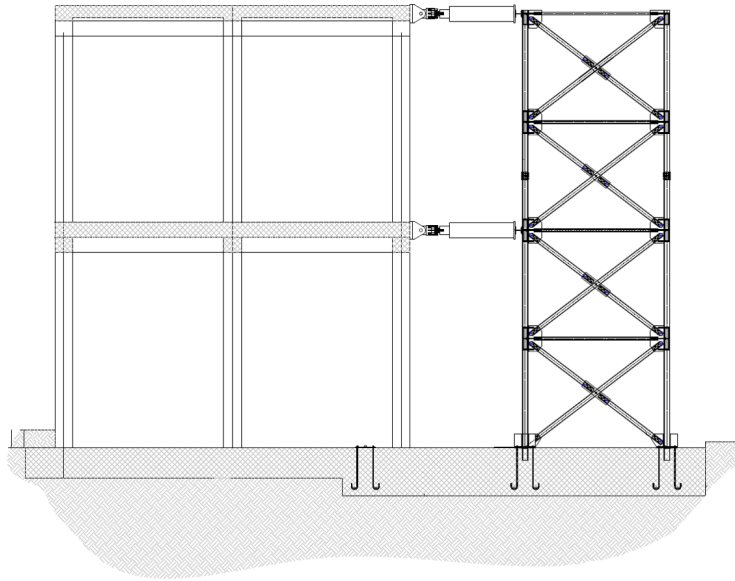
Schematic drawing of test set-up (adapted from [79]).
